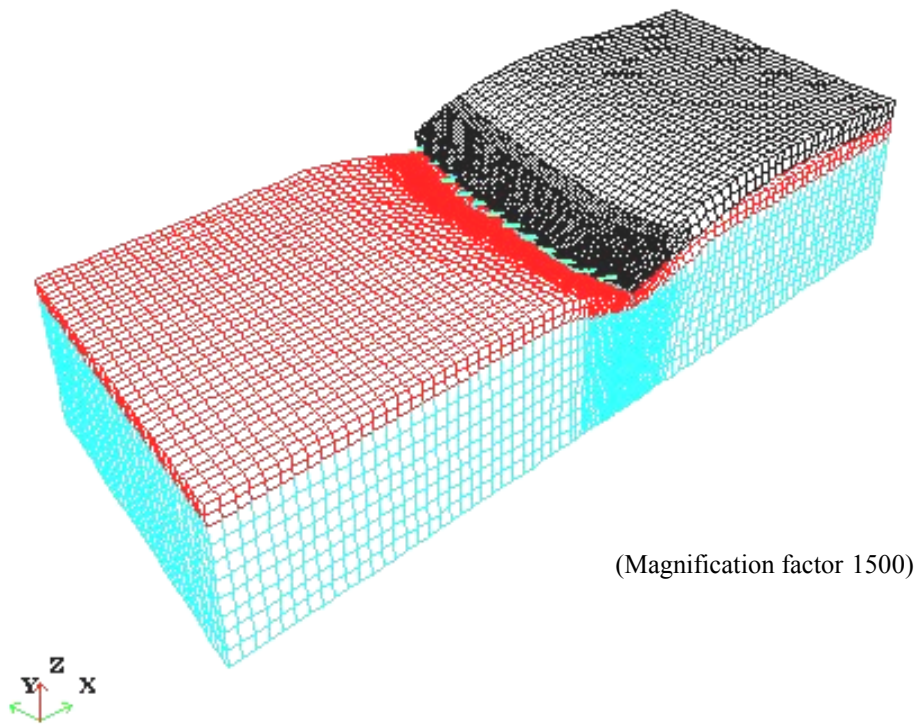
Deformation of skewed joint pavement, one slab removed, due to FWD load
